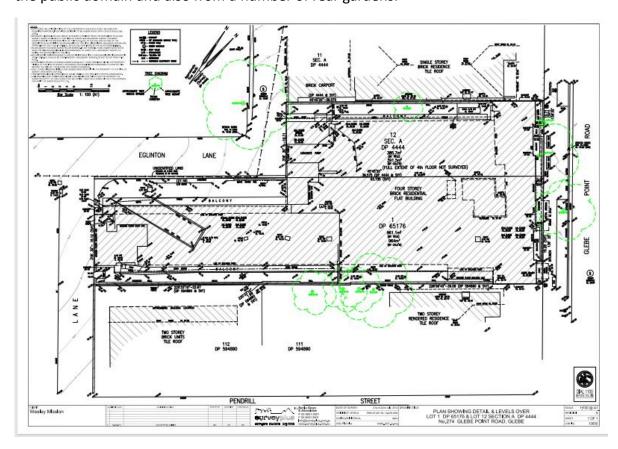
Survey Plan showing setbacks for the north elevations of 274-276 Glebe Point Road Glebe
